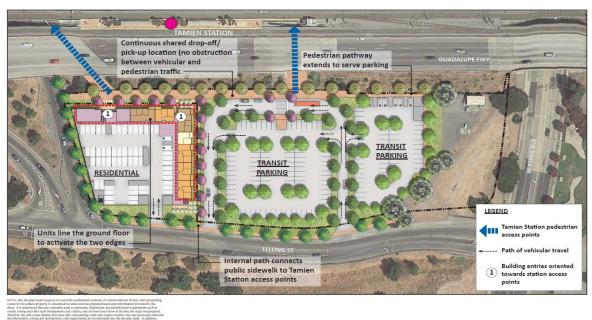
Tamien West TOD Site Conceptual Site Plan
